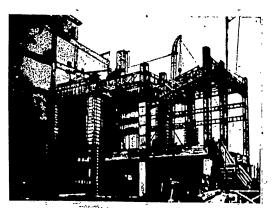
Assembly of welded steel reinforcing skeleton parts for the bunker section frame by means of a swing jib crane:
